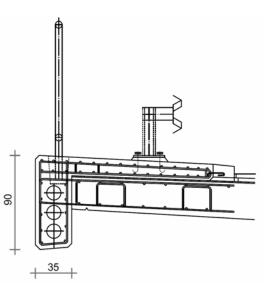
3 ducts of ∅ 125 mm in the edge beam
